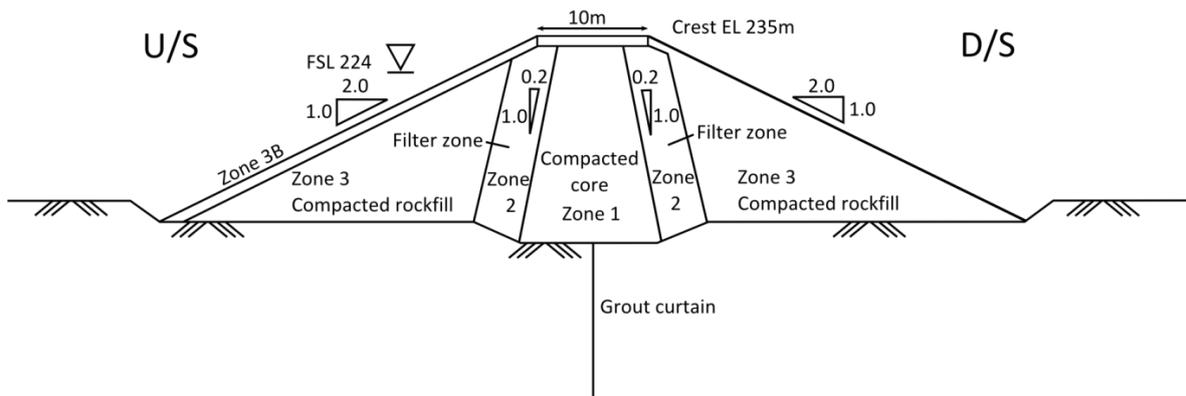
Proposed structural arrangement of Cave Hill dam
